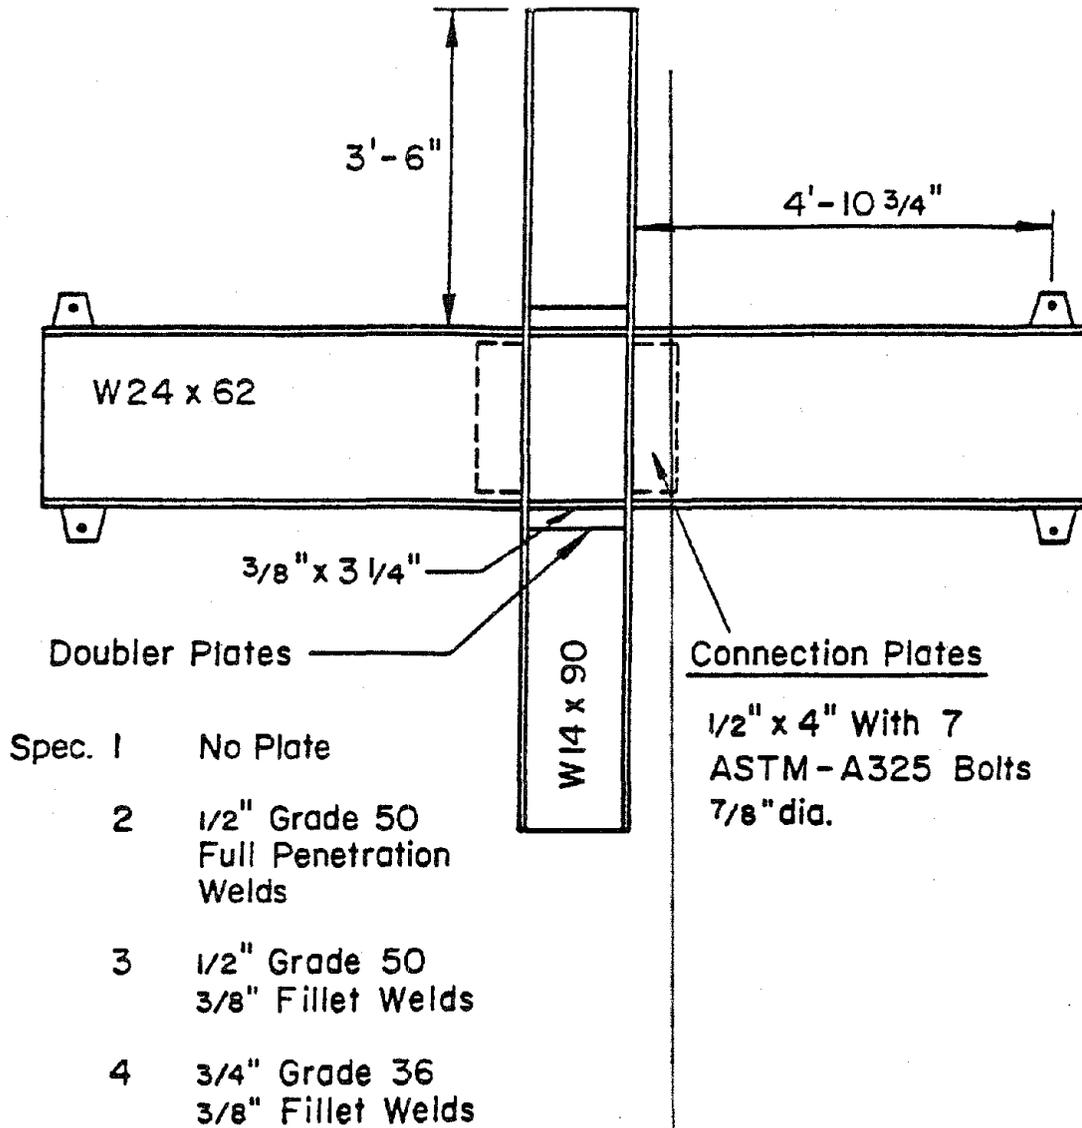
Details of Beam-Column Specimen Used for Validating Inelastic Panel Zone Model
